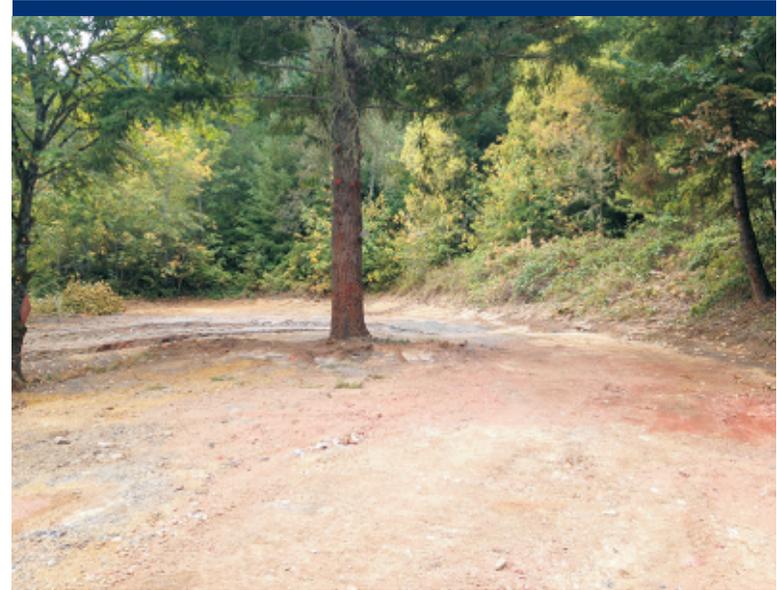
Excavation of mine-waste material in the south section of Residence 1.
